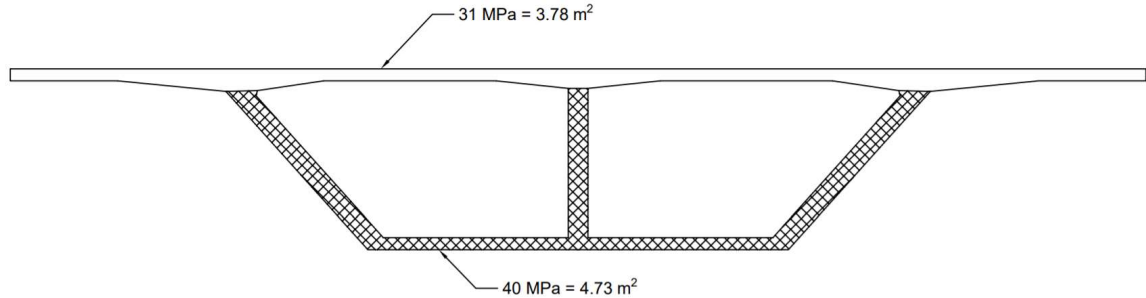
Typical use of 40 MPa concrete over Piers 2 and 3 (m)
